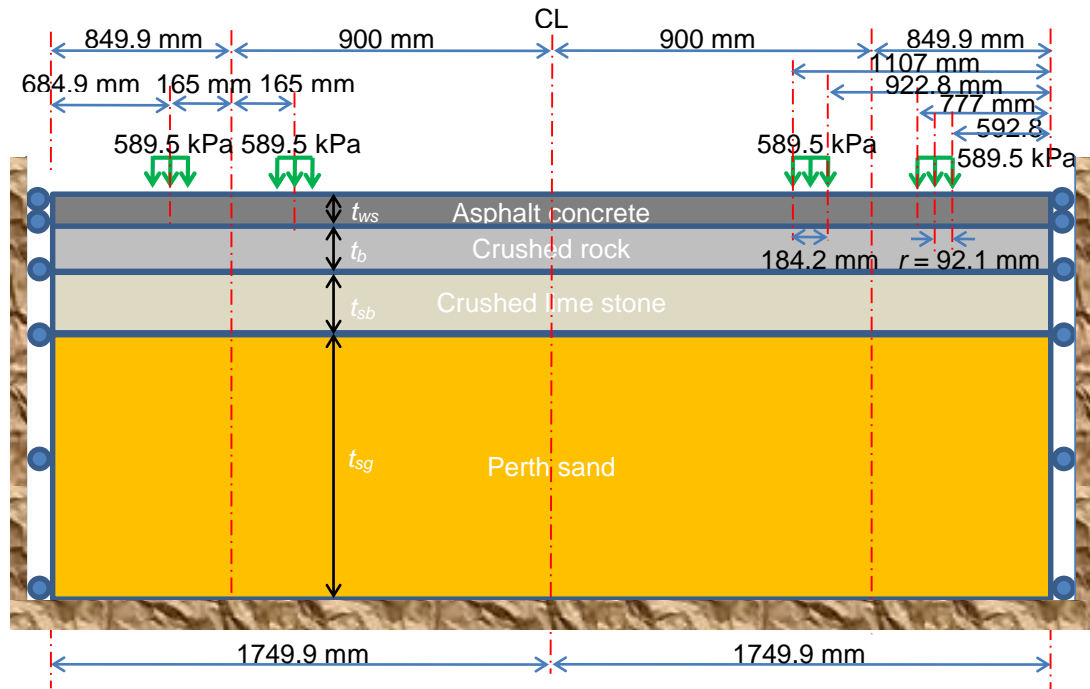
Structural section of road pavement uses as finite element model for analysis using ABAQUS
